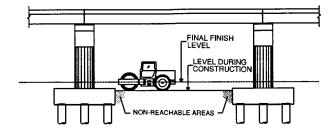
Details of elevated highway at Jalan Kem, Port Klang
